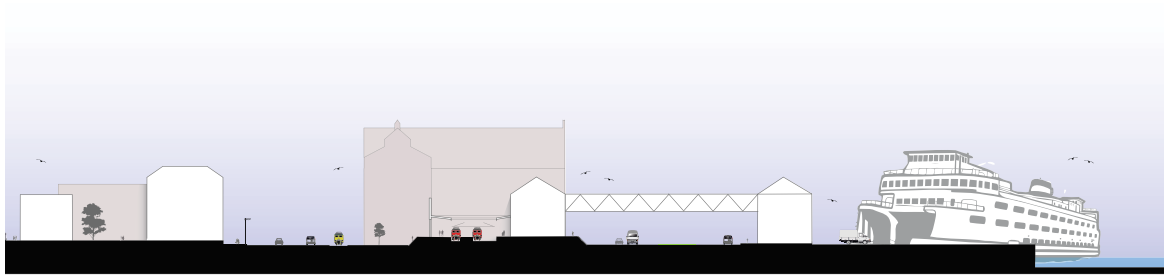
section trough city centre, train station and ferry area showing the different heights (by author)
